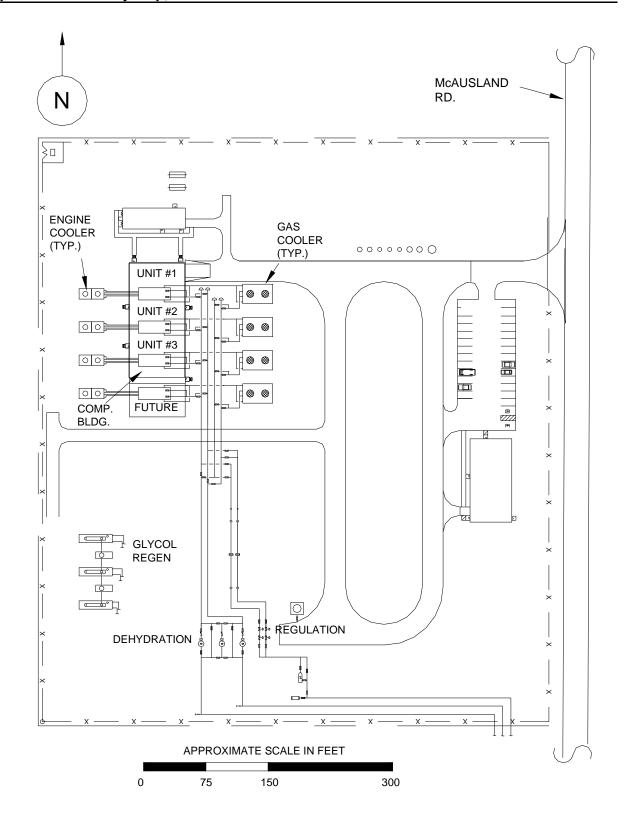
Proposed Central Valley Gas Storage Compressor Station Plot Plan
